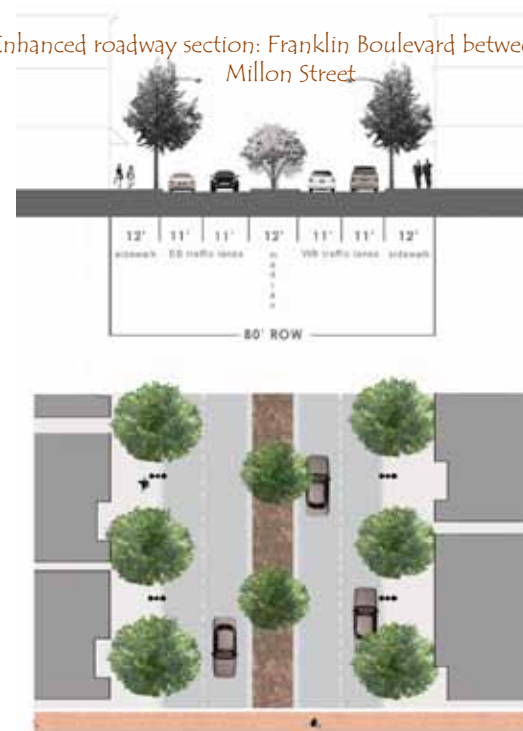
Enhanced roadway section: Franklin Boulevard between Vance Street and Millon Street
